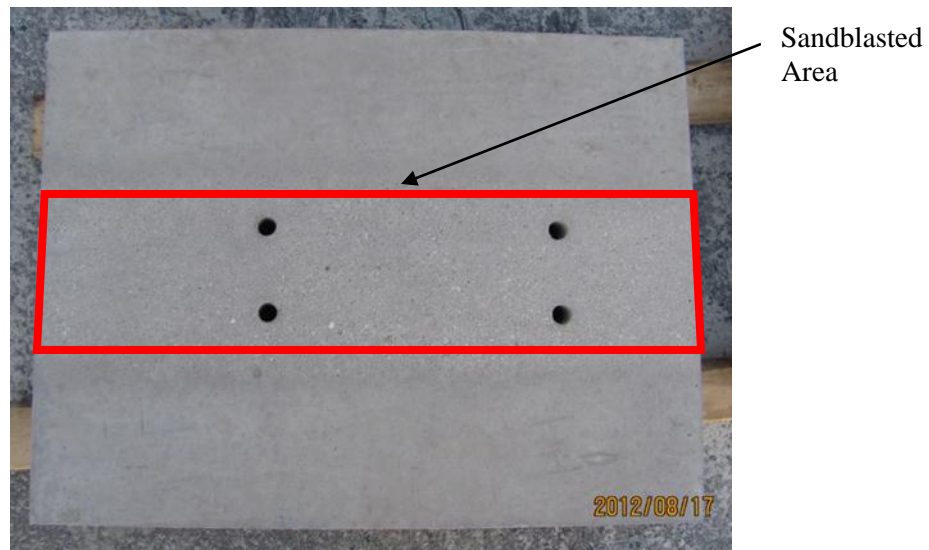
Sandblasted Concrete Slab Panel for Friction Enhanced Type II Specimens
